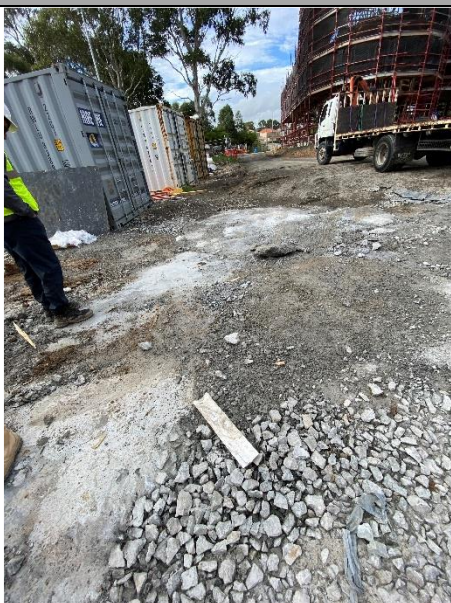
Concrete pad made with excess concrete to stabilise the truck turning area in the north east of the site (A2_NC05)
